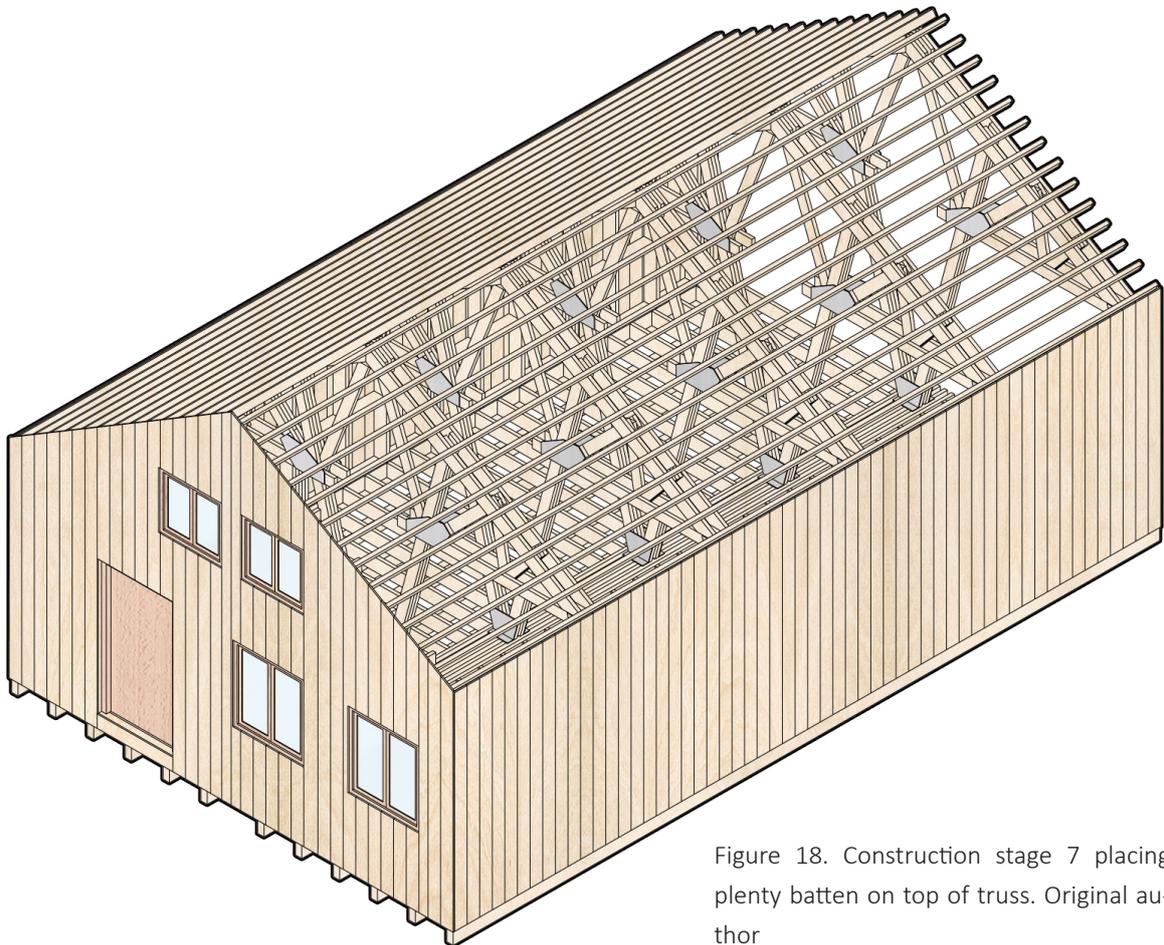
Construction stage 7 placing plenty batten on top of truss. Original author
